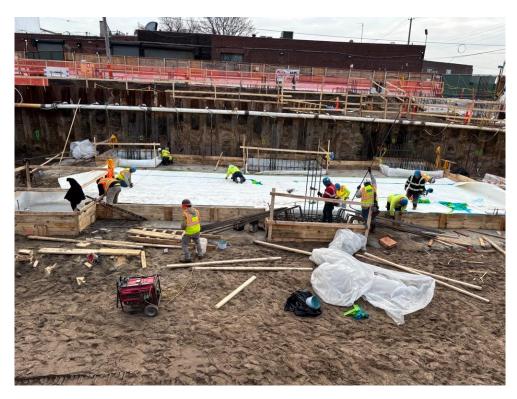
ECD installing waterproofing/vapor barrier membrane within the detention tank area in the western part of the site (facing west).
